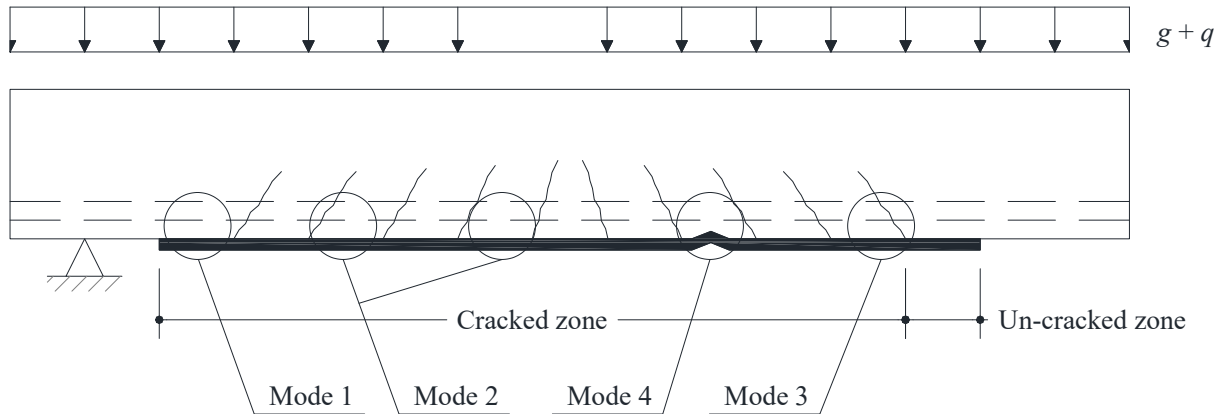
Loss of bond between reinforcement and concrete.
